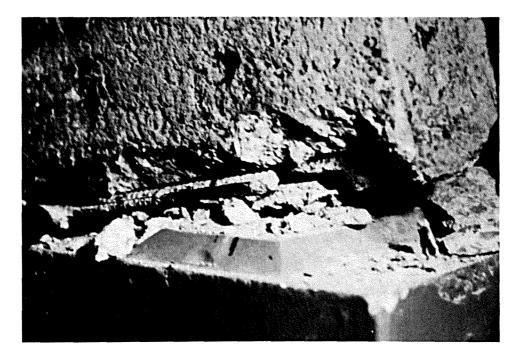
Diagonal tension failure of beam with pullout of reinforcement from the concrete at failure
